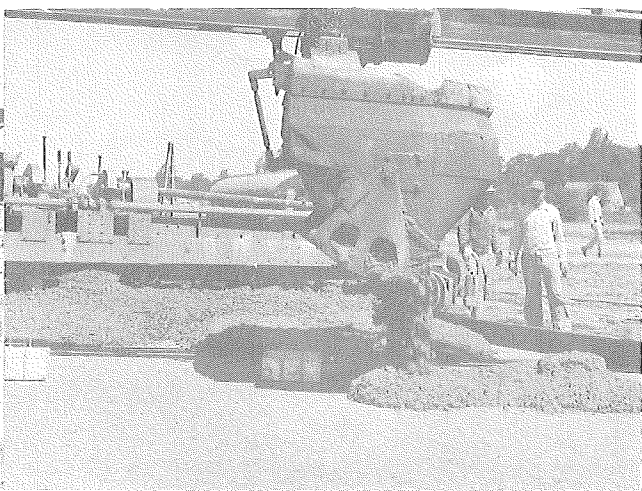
Some Concrete is Discharged on the Subgrade Before Filling the Second Pan with Concrete From the Middle of the Batch.
